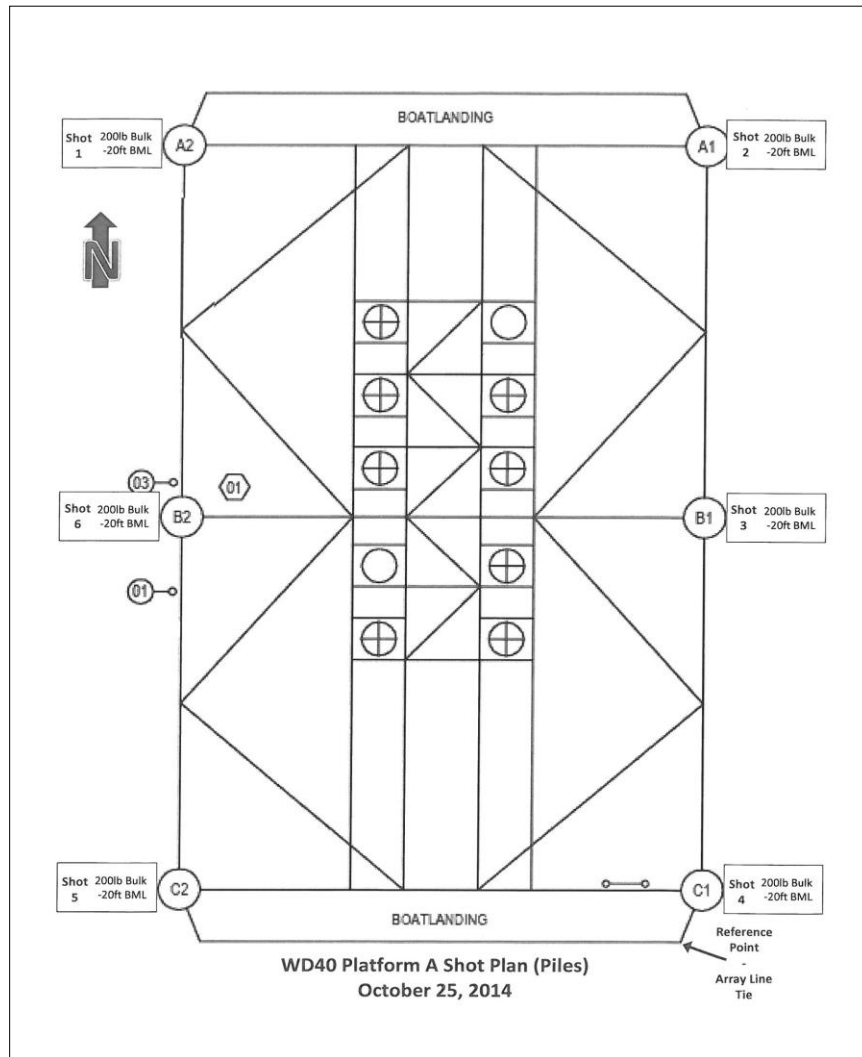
Top-down perspective of the shot plan schematic for WD40A piles (A1 and C2).
